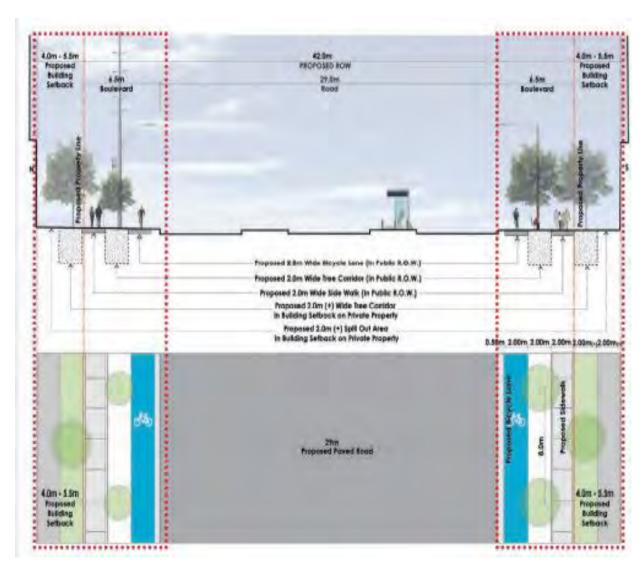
Dundas Connects Master Plan Figure 5-63 – Raised Cycle Track & Street Trees
